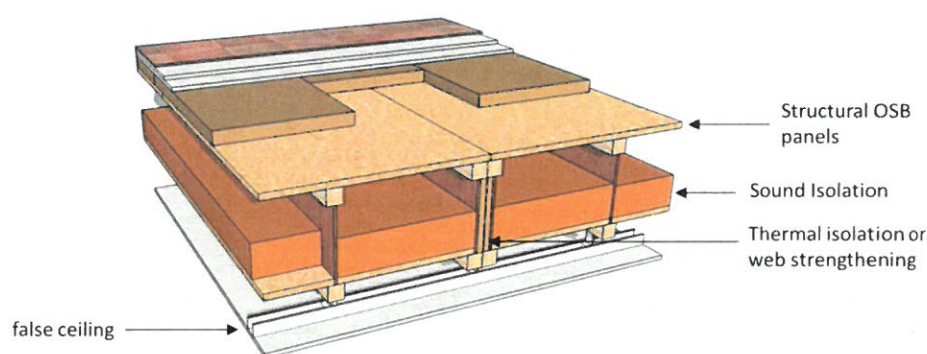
Example of I Beams use in floor solutions (system STEICOjoist)
